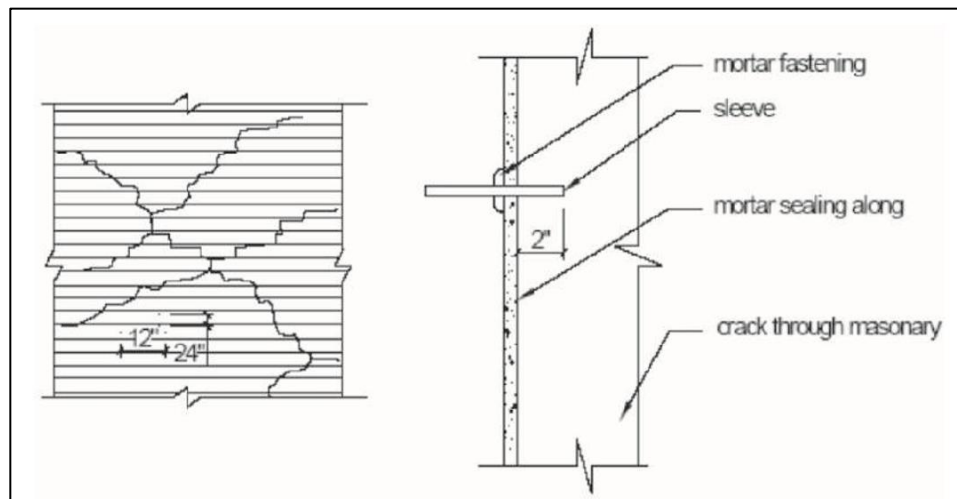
Injection repair of cracks in masonry walls
